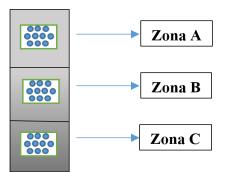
The zones for shooting at column surface for Rebound Hammer Test
